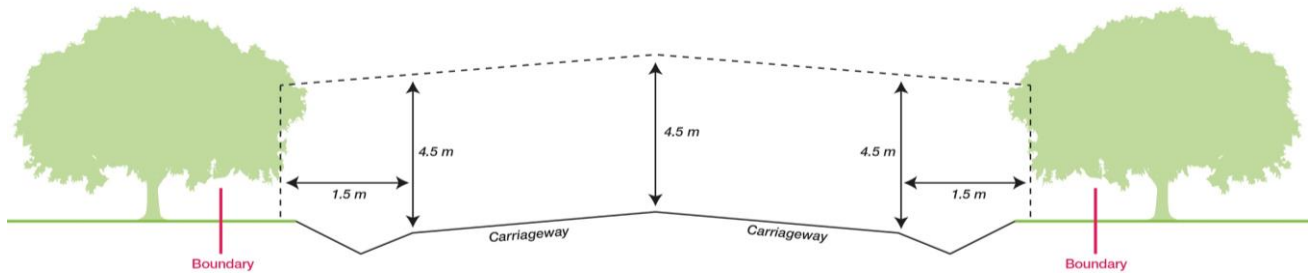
Vegetation Envelope for a Typical Rural Road (Sealed and Unsealed)
